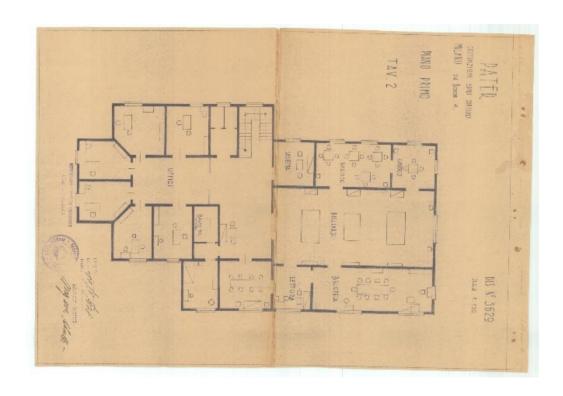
First Floor plan. (Ref. Arkivi Qendror Teknik I Ndertimit)
